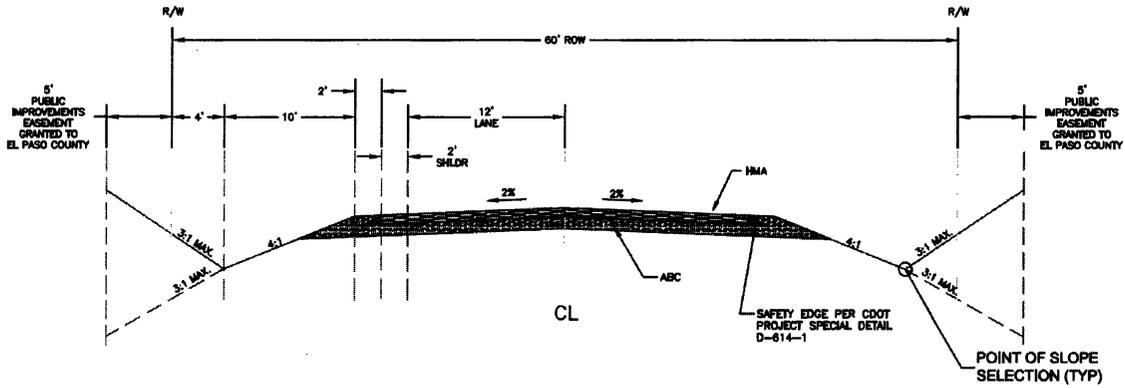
Typical Rural Minor Collector Cross Section
